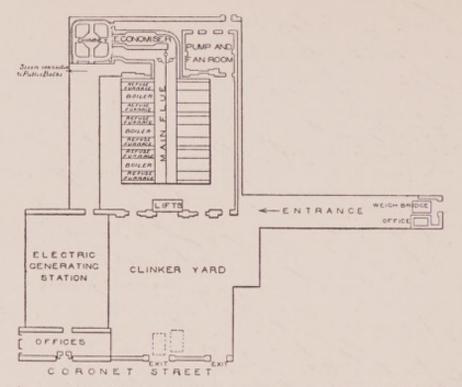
SHOREDITCH COMBINED DESTRUCTOR AND ELECTRICITY WORKS. Plan.
